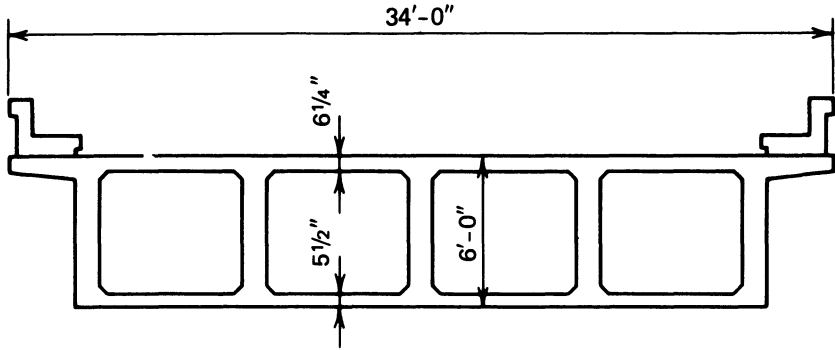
Section of a long-span cast-in-place prestressed-concrete bridge.
